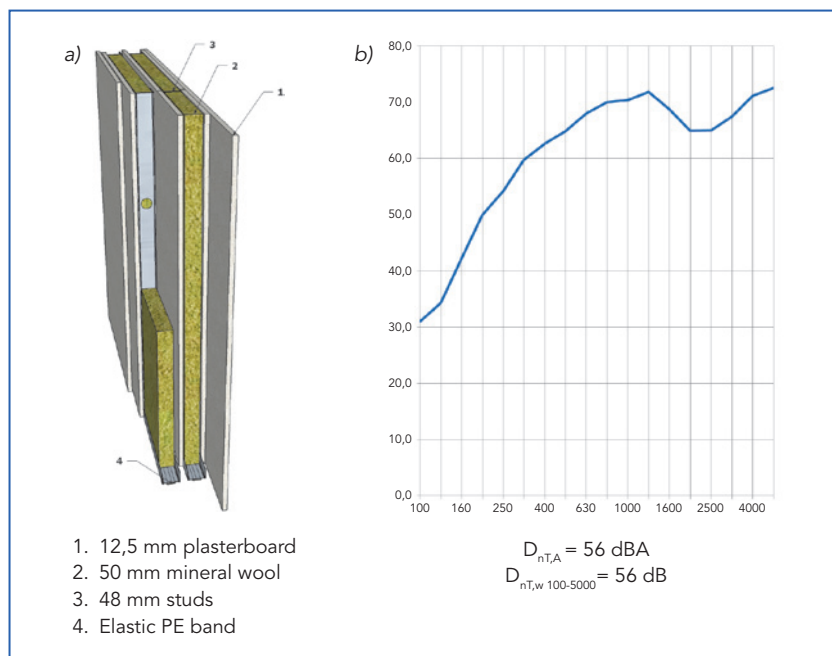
a) Separating wall. Type 3. Framed walls with absorbent materials; b) Typical airborne sound insulation. [[2]- (Spain)].
